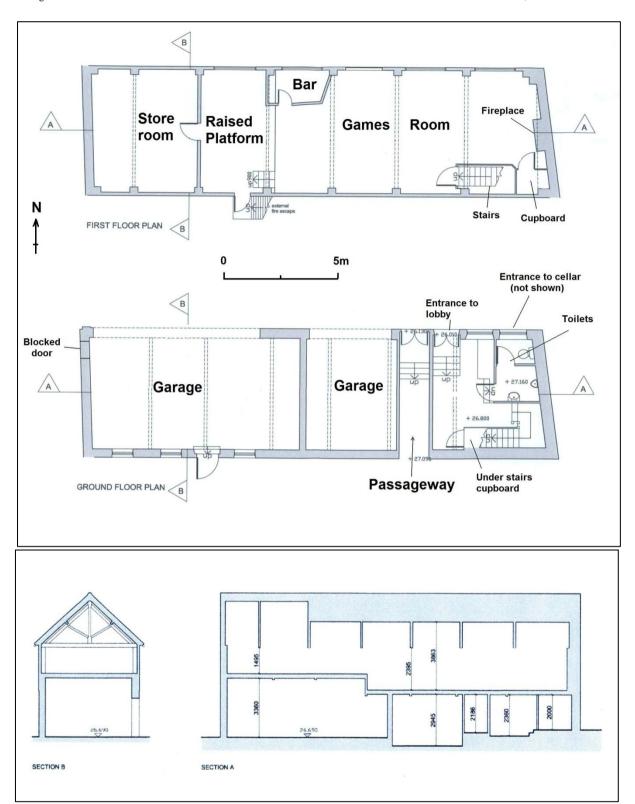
190 High Street, Lewes: Plans and Sections of outbuilding (Adapted from Stainsby Architect drawing)
